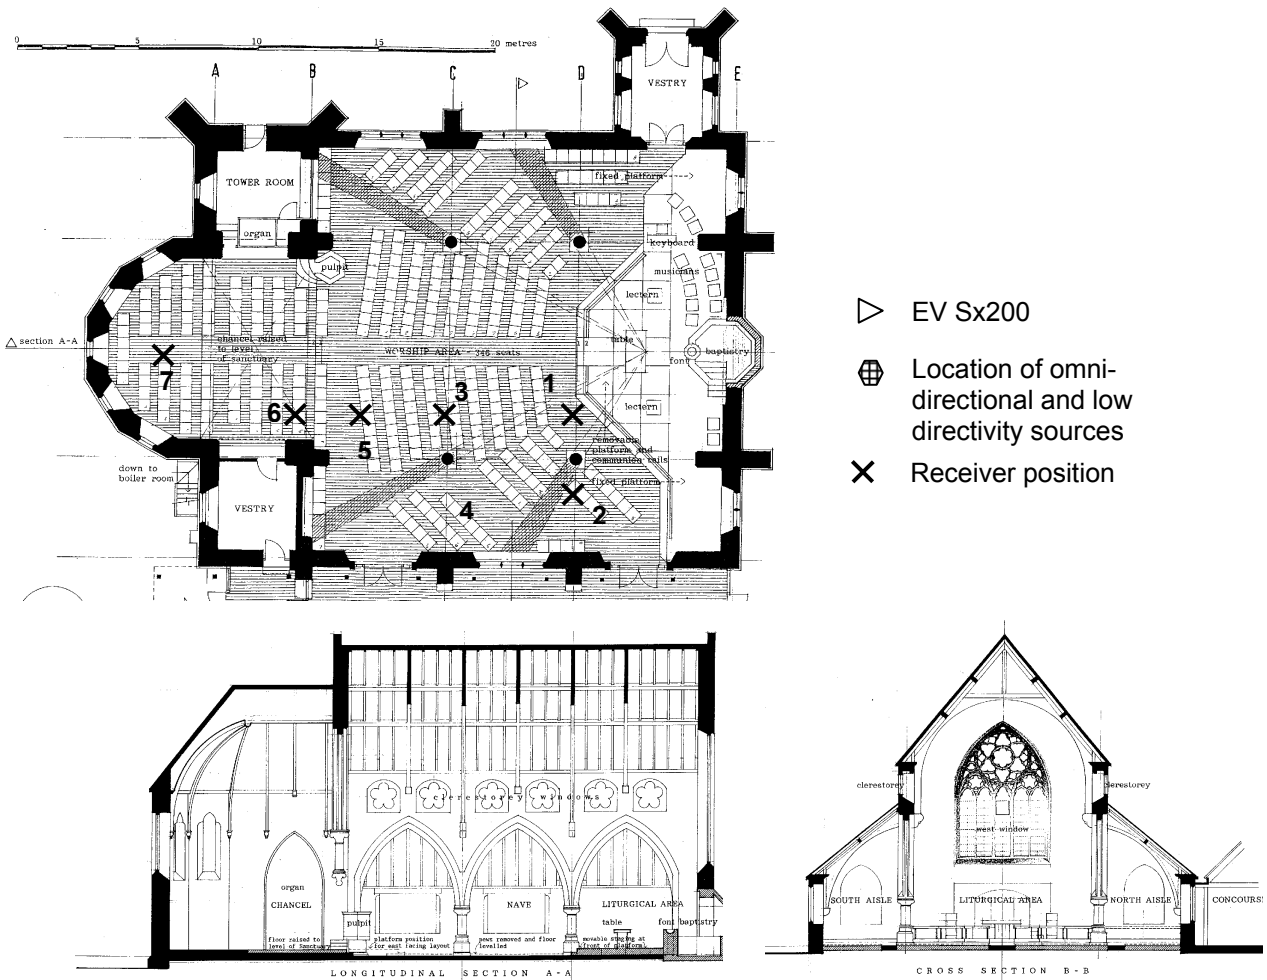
Plan, elevation and sectional view of Christ Church Winchester
